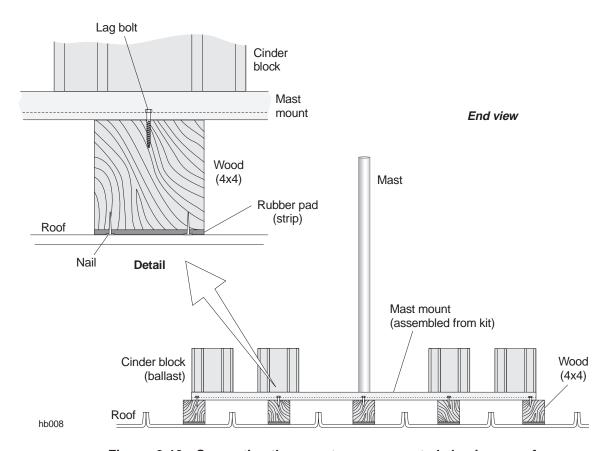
Supporting the mount on a corrugated aluminum roof
